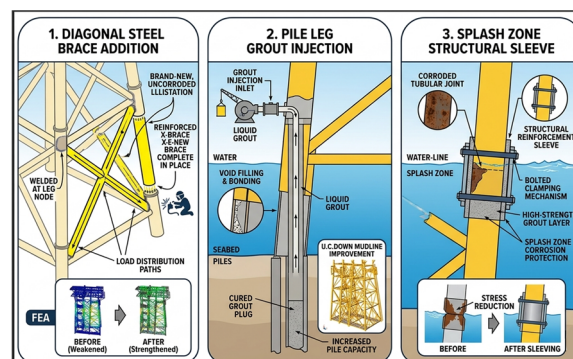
Detailed technical schematic of three key offshore jacket retrofitting techniques: (1) Diagonal Steel Brace Addition; (2) Pile Leg Grout Injection; (3) Splash Zone Structural Sleeve. Schematic created by the authors based on offshore jacket retrofitting techniques reported in [9, 23, 35, 92]
